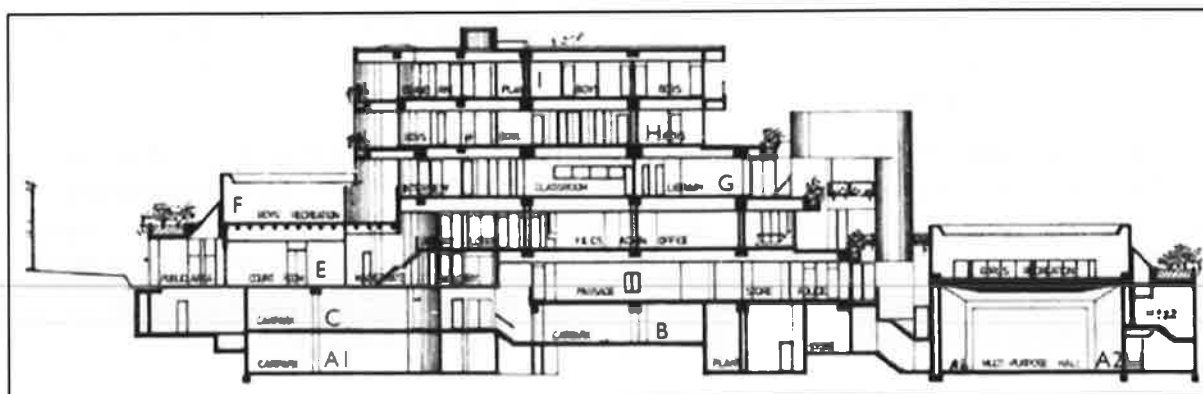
Existing Building Envelope for the former Court and MRC Building (Source: Council's Planning Proposal)
